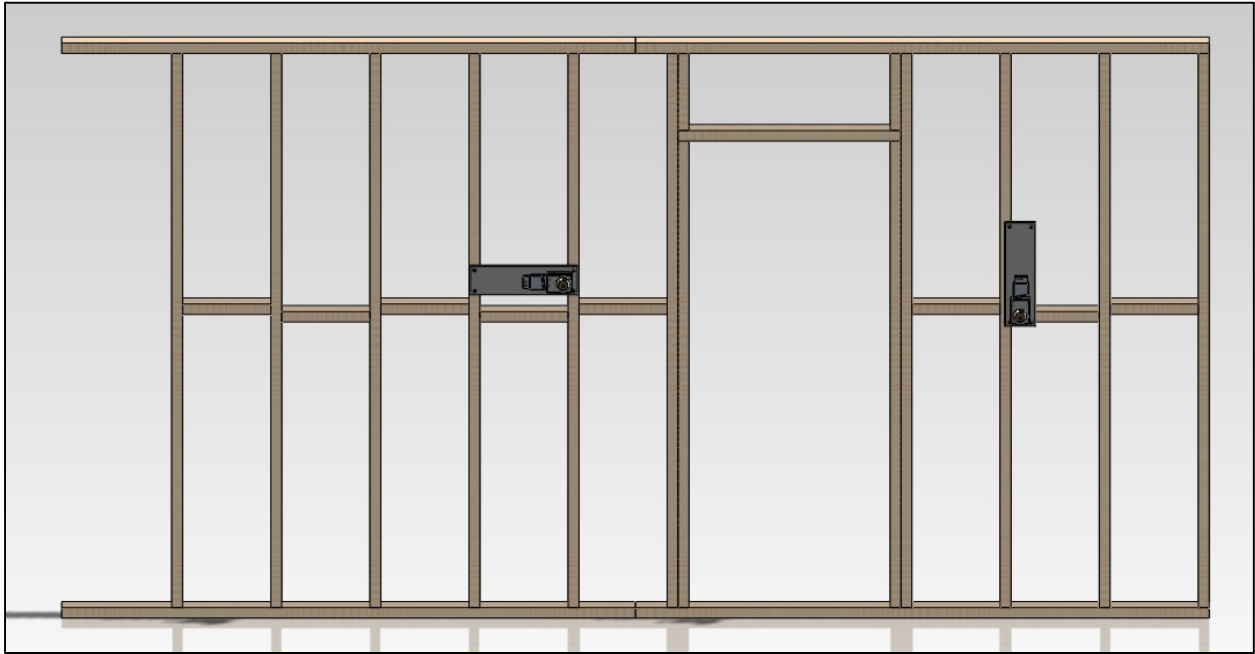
STRUCTURE OF A TYPICAL RESIDENTIAL WOOD-FRAMED WALL IN THE U.S.
